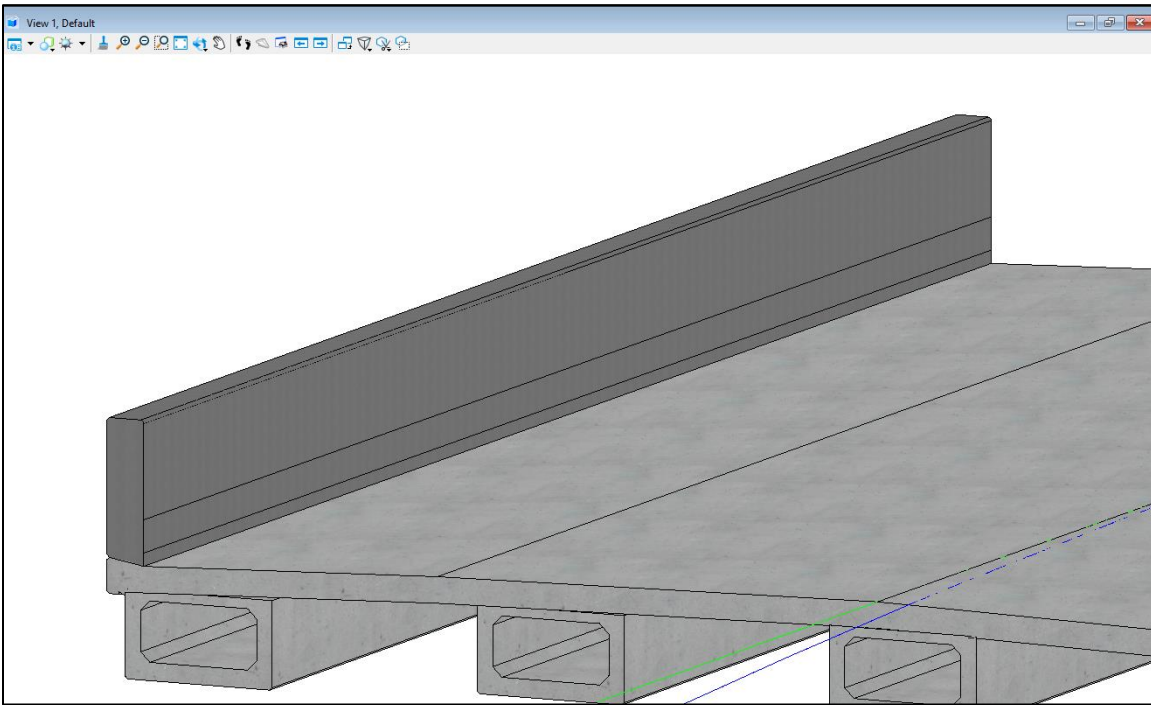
42" Vertical Wall Concrete Barrier
